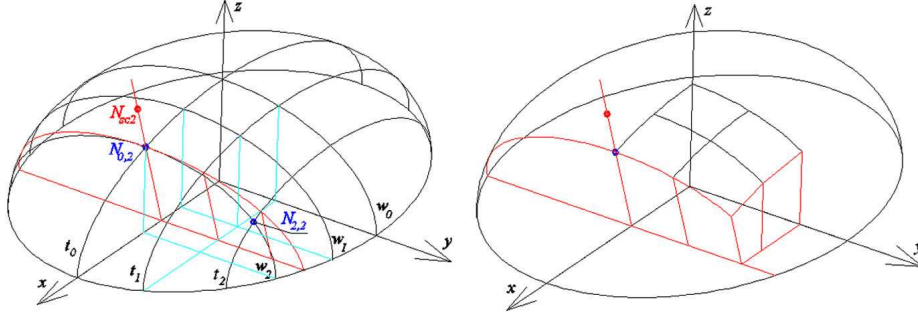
Geometrical shaping of a structure having two slope gable walls
